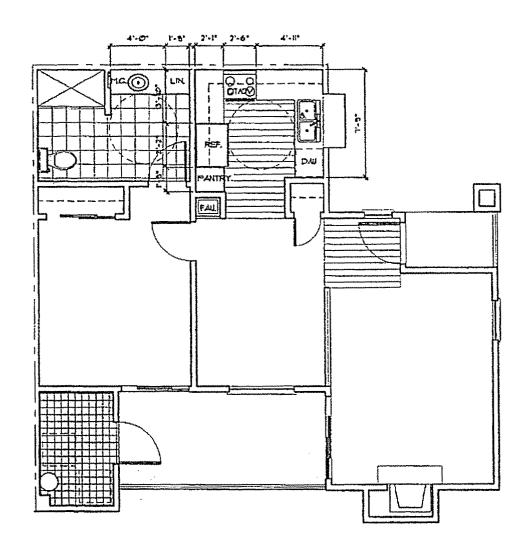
# EXHIBIT F DRAWING DEPICTING THE ONLY PORTIONS OF UNIT IN WHICH OWNER MAY INSTALL HARD SURFACE FLOORING
